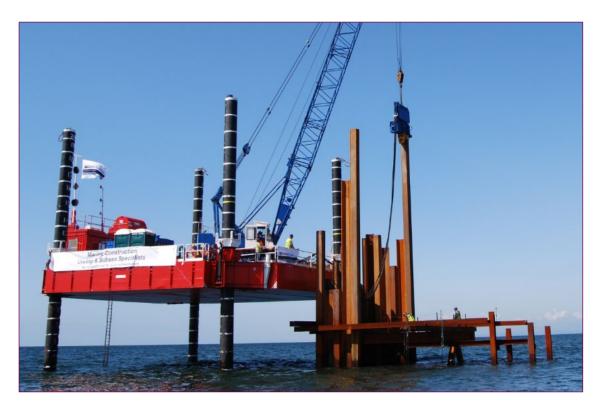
Typical Jack-Up Barge Completing Marine Piling
